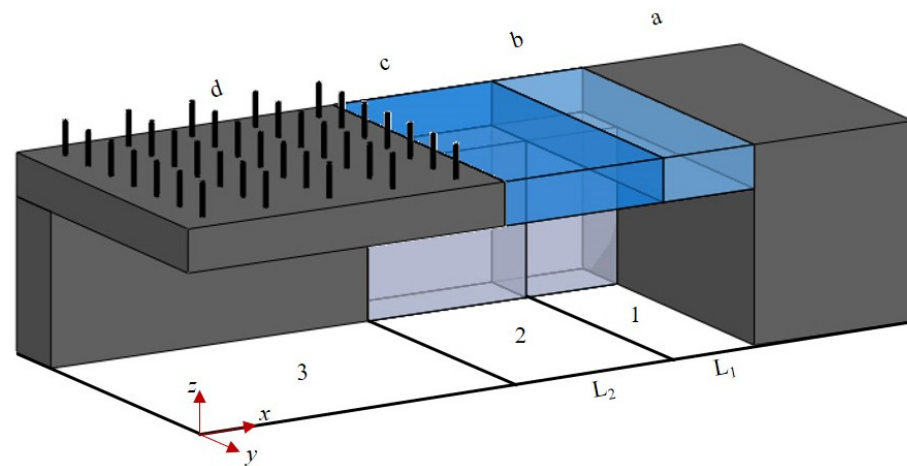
Relationship between tunneling system and surrounding rock (a—unexcavated area; b—unsupported area; c—temporary support area; d—permanent support area; 1—excavating system; 2—temporary support system; 3—anchor drilling system;).
